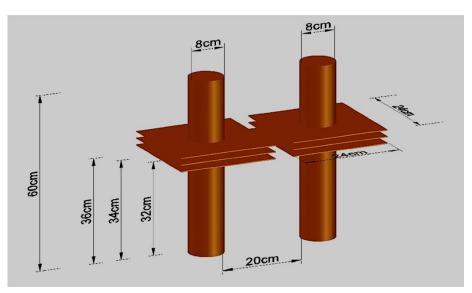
Interaction of two piers in a tandem arrangement with triple square collars of dimensions 24×24 cm
